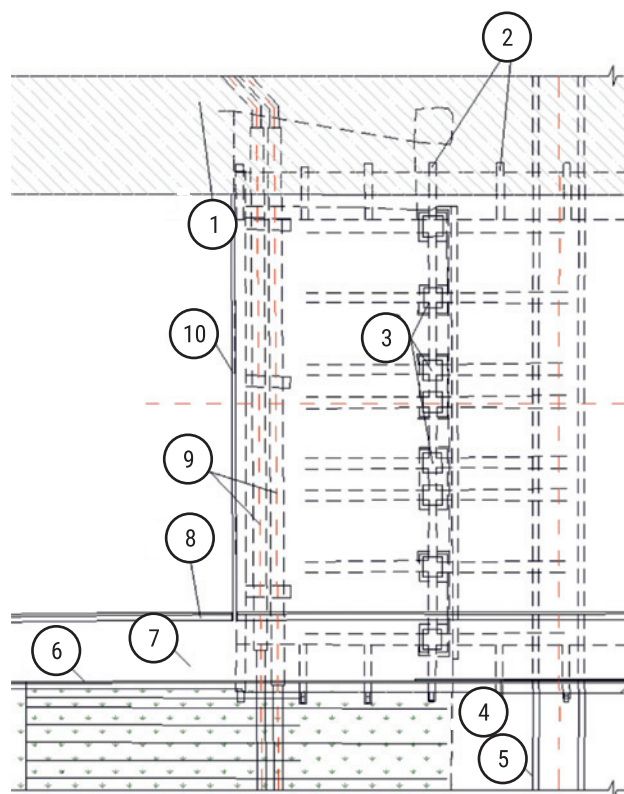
Plan of the flyover: 1 – reinforced concrete communication box; 2 – reinforced concrete ribs of the superstructure; 3 – support posts; 4 – protective shields; 5 – railway track; 6 – railing; 7 – sidewalk; 8 – reinforced concrete barrier fence; 9 – metal pipes in the casing; 10 – deformation seam
